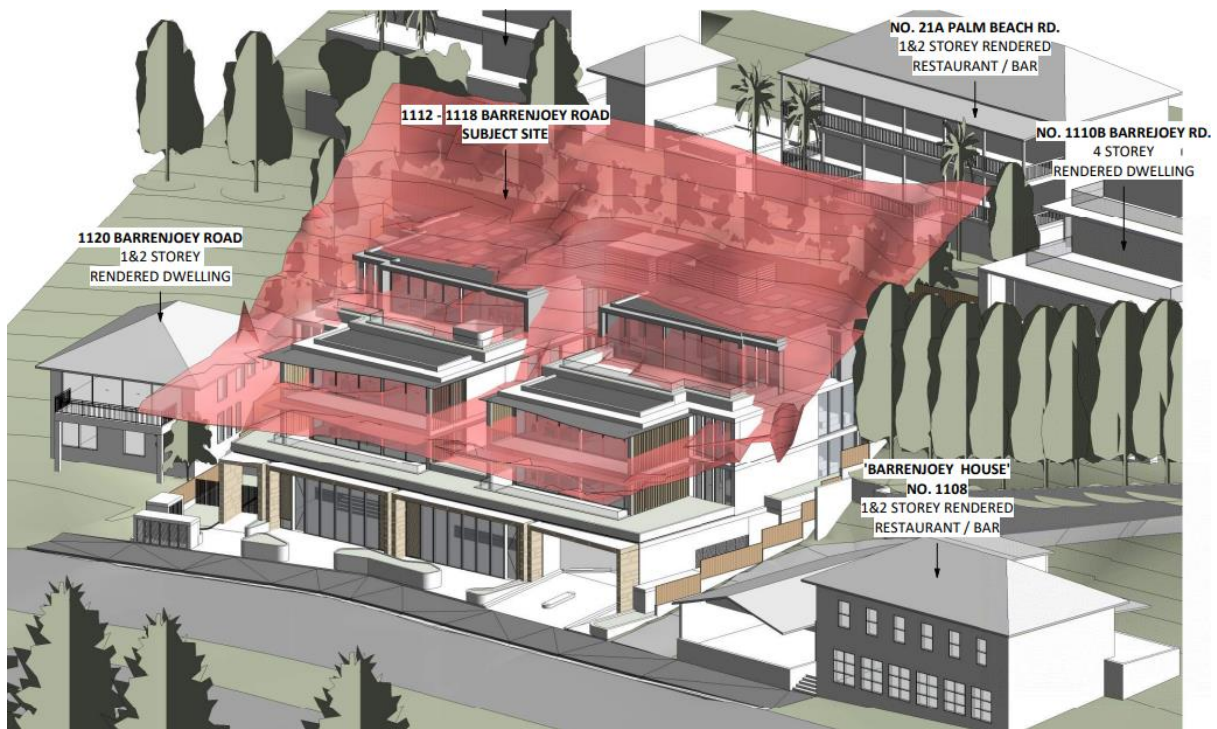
Plan extract depicting the 8.5m building height plane breaching elements measured above ground level (existing) being the existing disturbed levels of the land.
